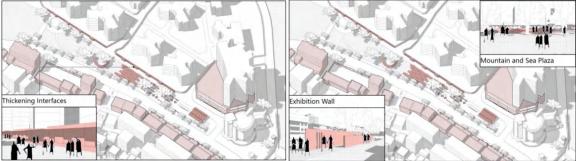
Leisure Street Design (Source: Drawn by the Author)
